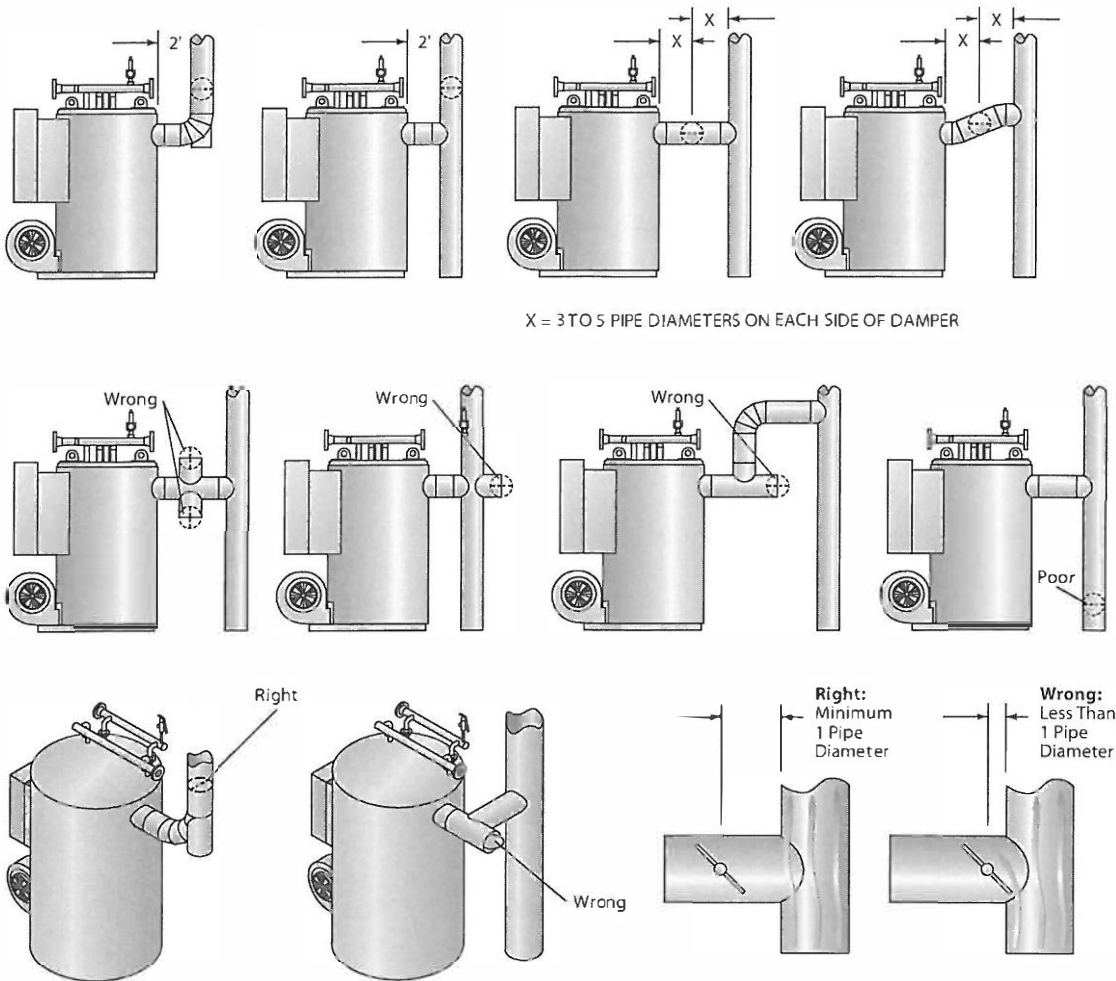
BAROMETRIC DAMPER INSTALLATION
